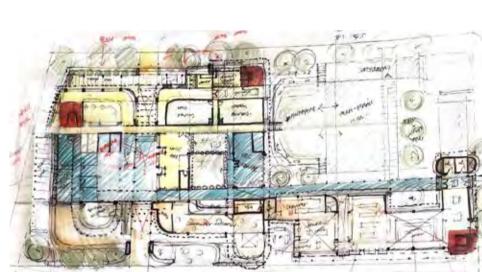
Floor plan development and initial spatial refinement (Author, 2023).
